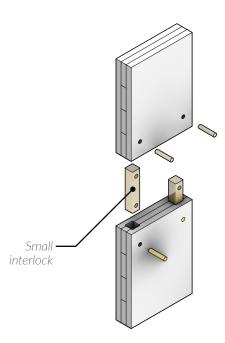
69. Exploded isometric view of joint type B (small interlock).
